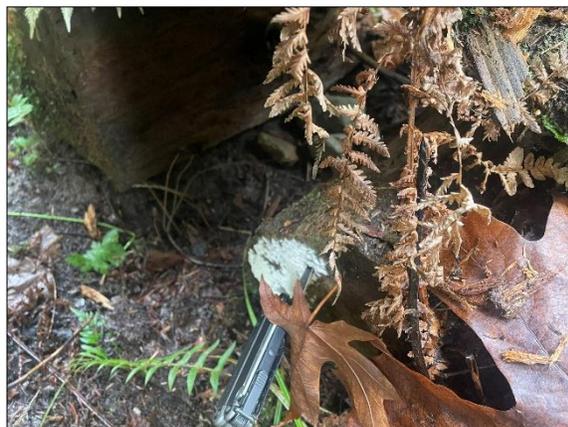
Bridge 1 Decking, note: soft at cut ends
